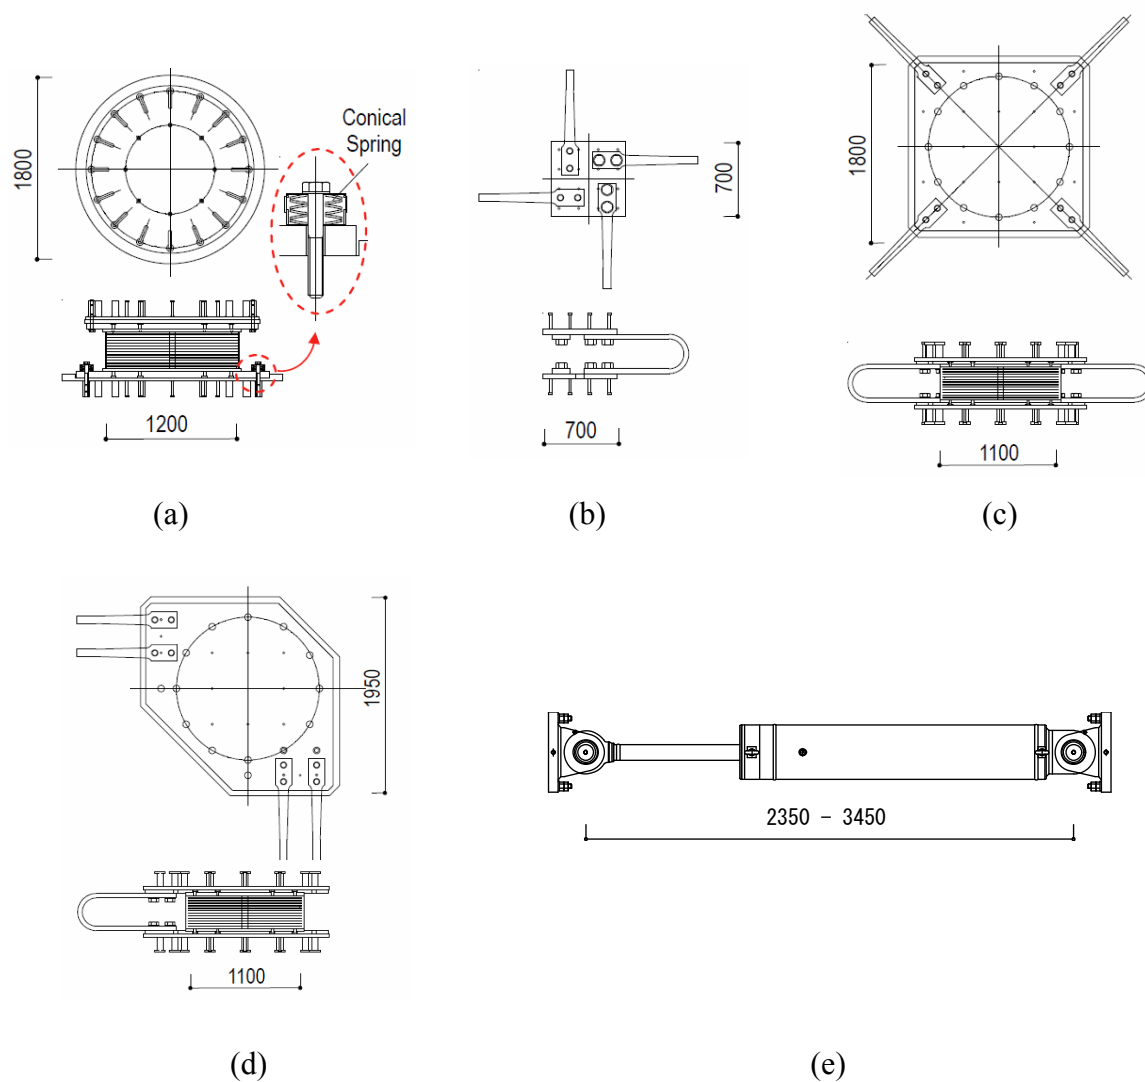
Rubber bearings and dampers used in the J2 base-isolated building (unit: mm)
